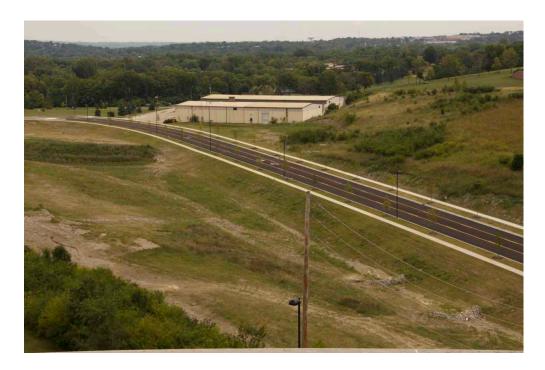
Vanguard Blvd. Looking Northeast Toward Building 61
